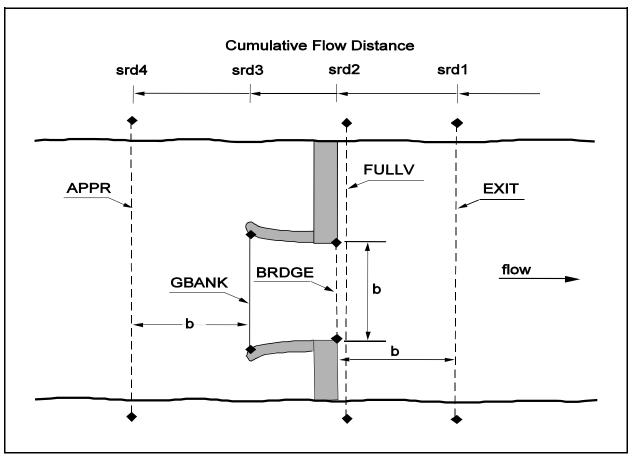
Definition sketch: cross-section locations, single-opening bridge with guidebanks.
